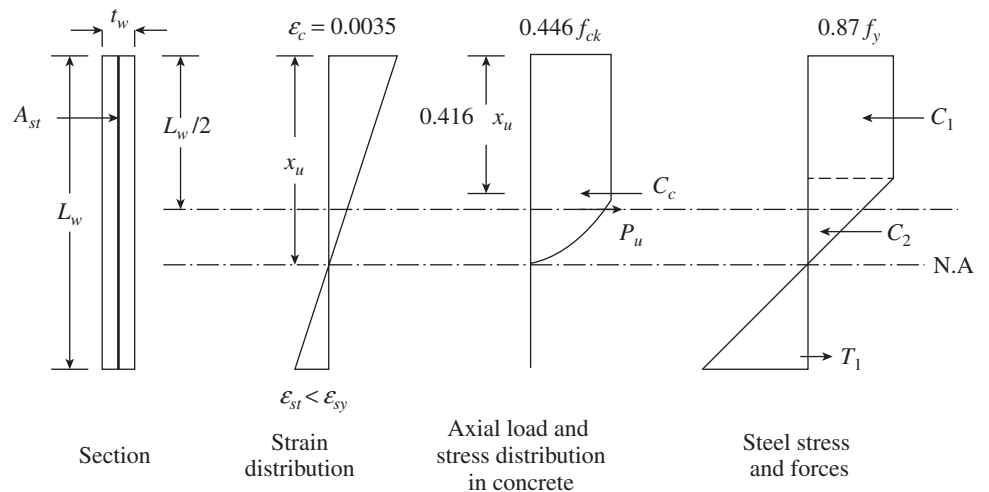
Stress–Strain distribution in structural wall (flexural compression failure)
